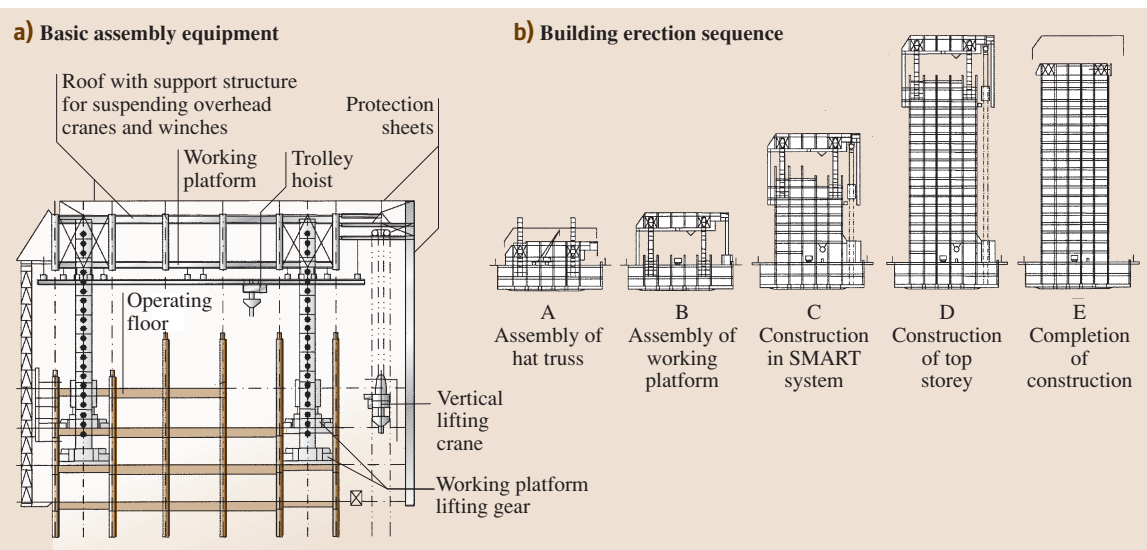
,b SMART system for erecting steel-frame buildings: (a) basic assembly equipment; (b) building erection sequence
